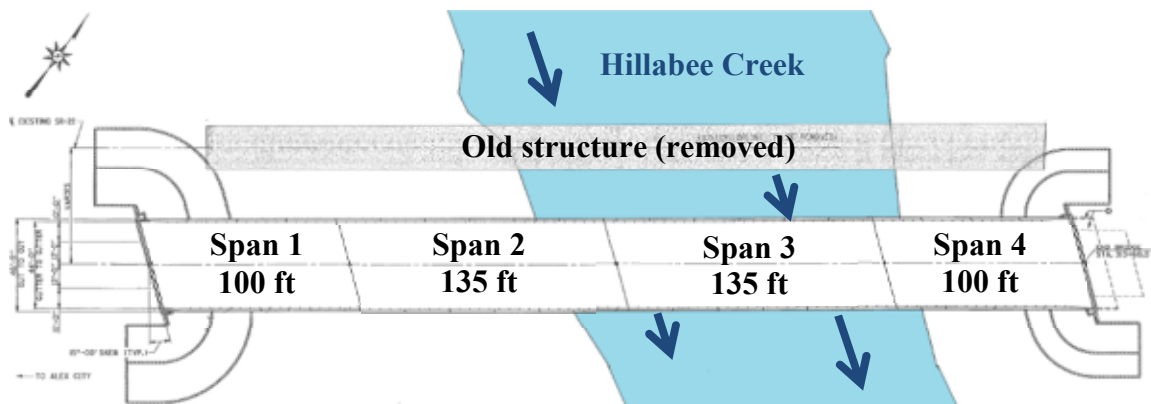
Plan View of Bridge with Respect to Hillabee Creek
